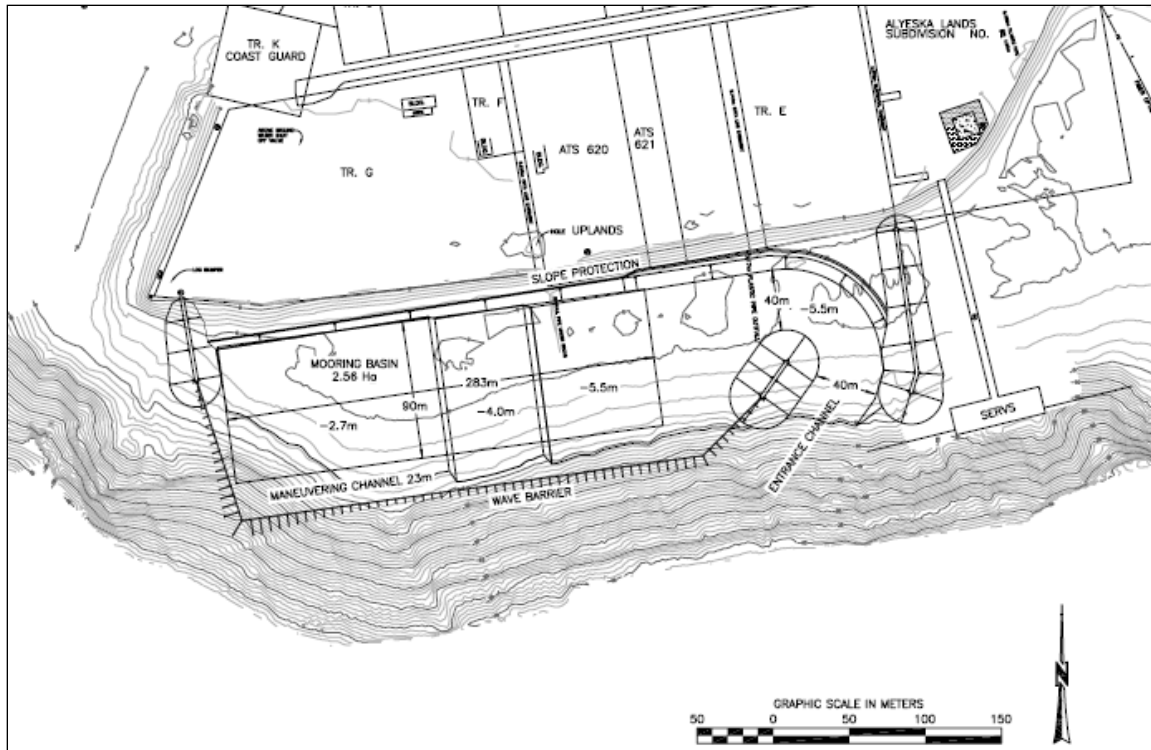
4. West Site Wave Barrier 243 - Vessel Configuration.
